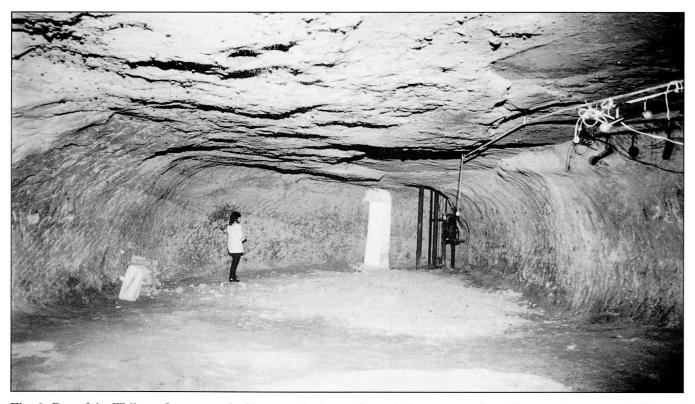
Part of the Wollaton Street cave, looking towards the northeast, before construction of its central support wall. Beyond the light patch of concrete in the foreground, the low pile of debris is the sandstone which fell from the roof early in 1997.
